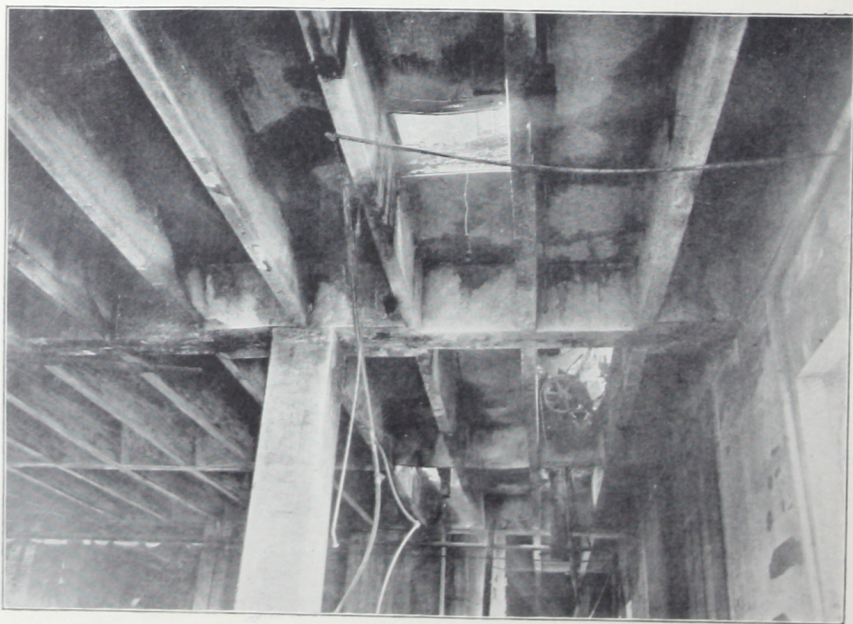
PLATE XVI. UNDERSIDE OF FOURTH FLOOR, SHOWING DAMAGE DUE TO HEAVY TANKS AND MACHINERY FALLING FROM ROOF.
